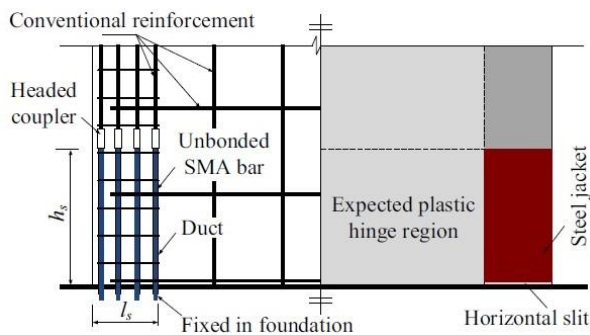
Reinforced concrete shear wall reinforced with SMA bars in its plastic hinge regions (Wang and Zhu, 2018)
